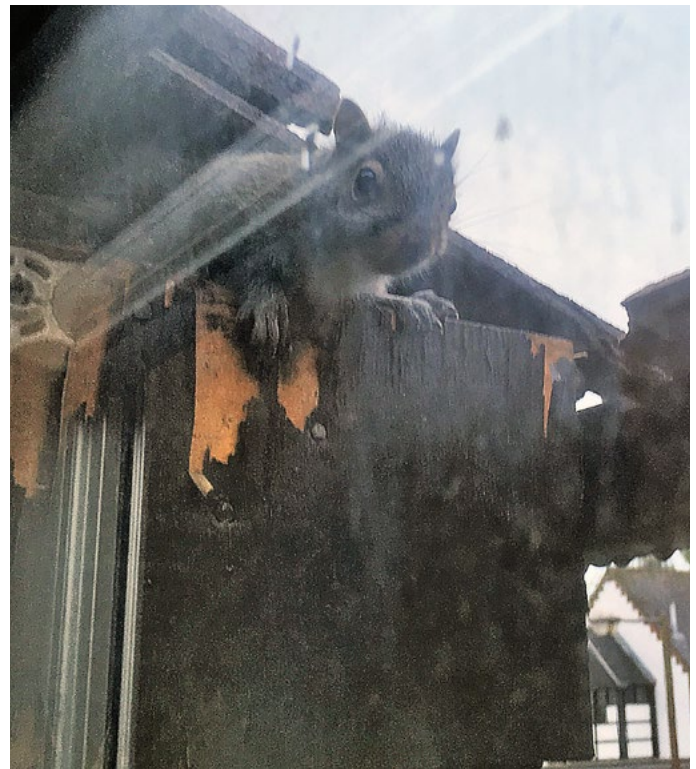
shows a grey squirrel coming out of a broken fascia board, and the damage caused.
